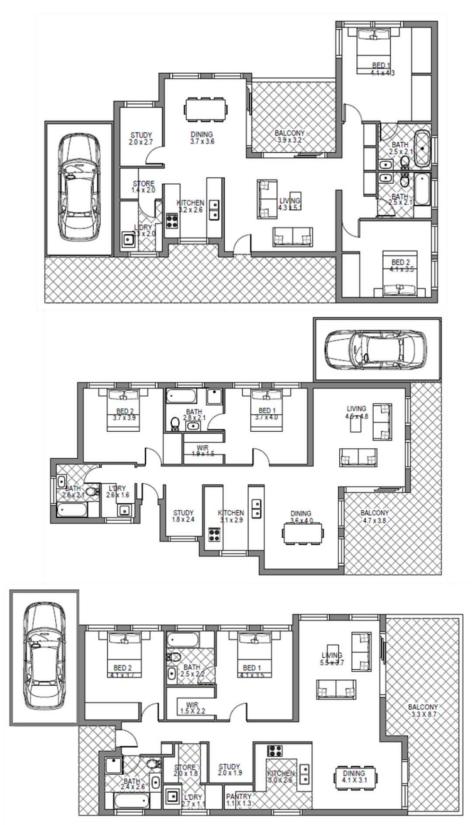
Example floor plans of 110m<sup>2</sup> dwellings
